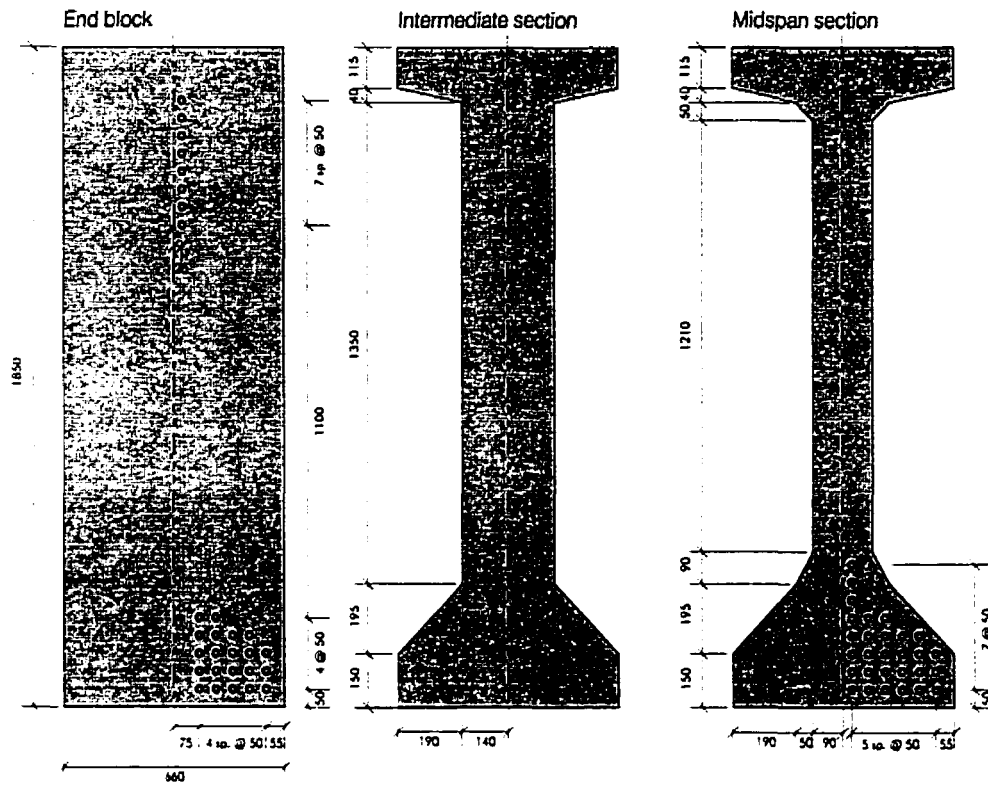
Concrete cross-section dimensions and prestressing strand locations
